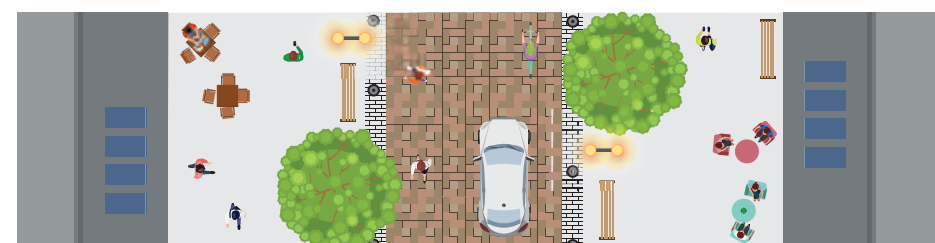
PROPOSED CROSS SECTION OF A NEW SHARED STREET
